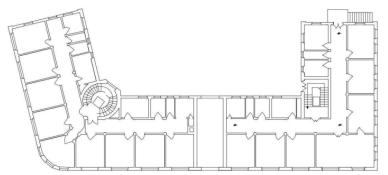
Ground Floor Plan of Medipol University Rectorate Building [27].
